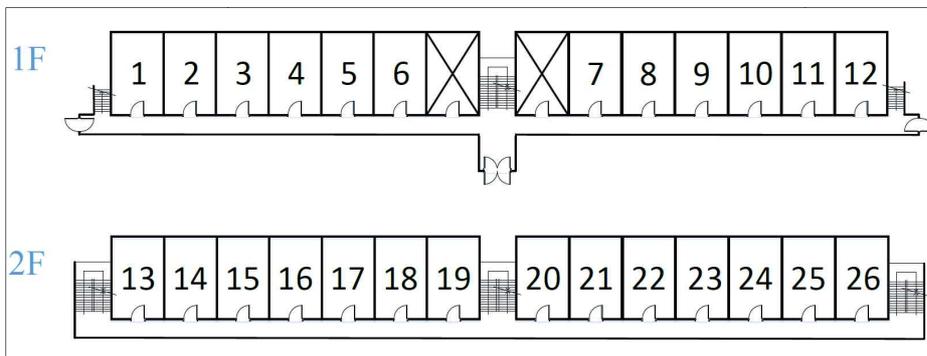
3 CO barracks possible layout (2-floor single corridor)
